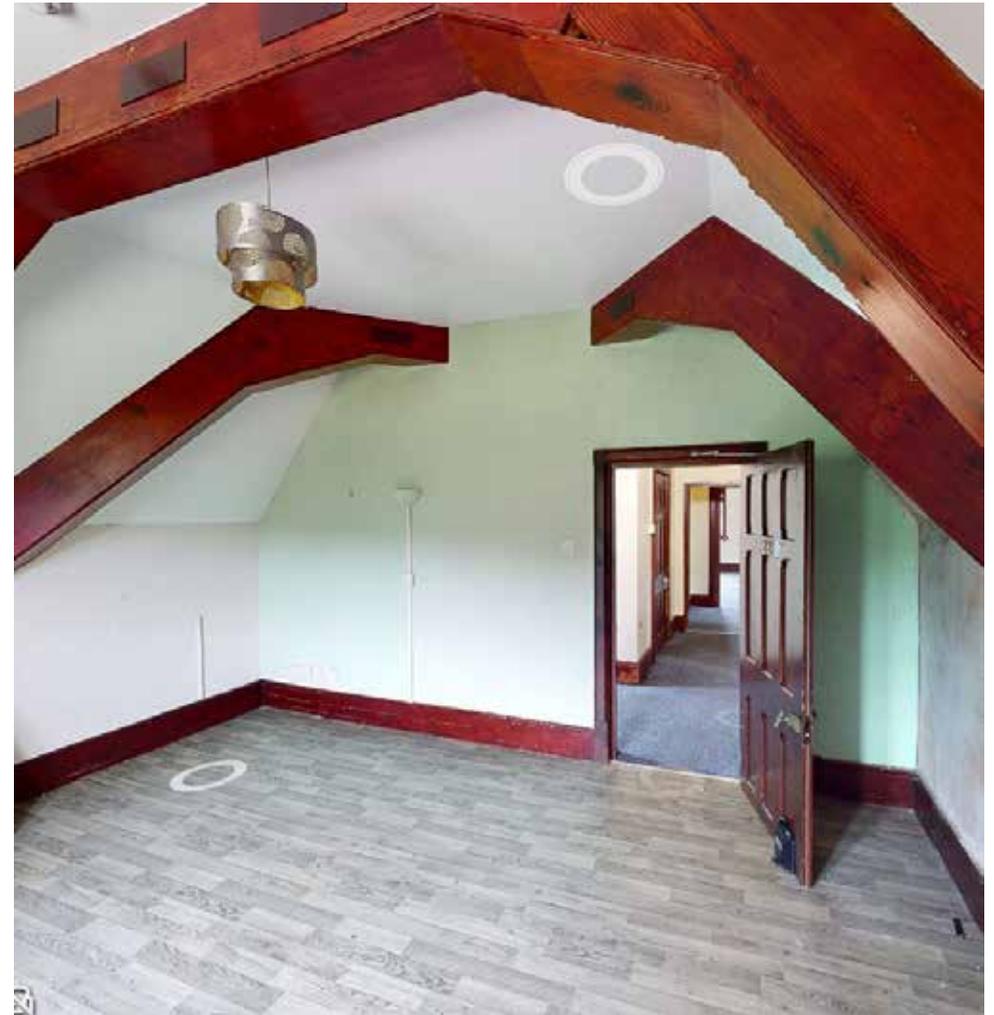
Photo of the second floor room showing attic spaces. Image to support heritage matrix proposed works 08.
